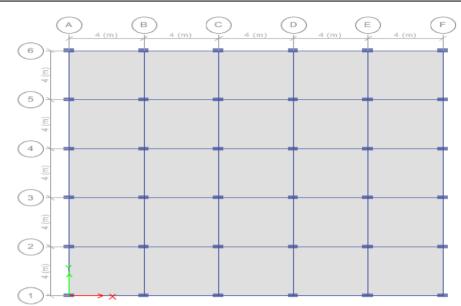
Plan of G+6 & G+9 Framed Structure.
